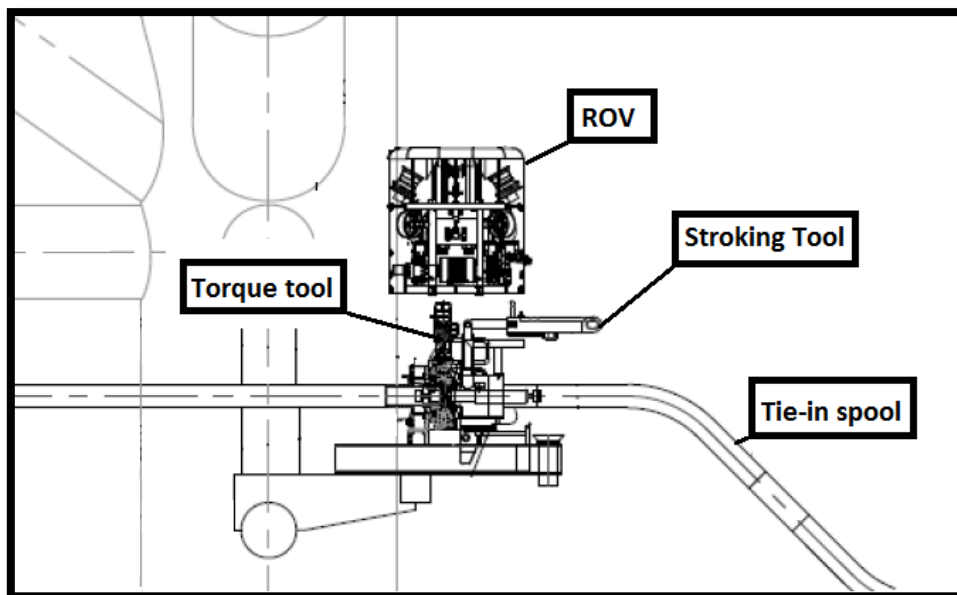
CLAMPING TIE-IN SPOOL
